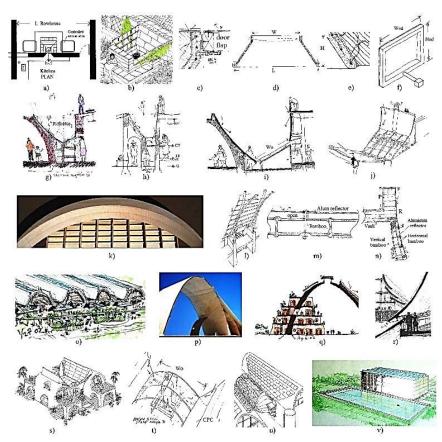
Supplemental Studies: a) row house plan showing reflections at E&W areas; b) trellises at E&W areas; c-d-e) ferrocement details at cookware door; f) cookware door; g-h) section drawings with vertical kitchen wall reflector; i-j) large CPC dryers; k-n) bamboo kitchen wall studies with aluminum reflector; o) multiple TRW nonimaging troughs for equatorial latitude locations with low seismic risk; p)sketch model of large vault for supporting fixed reflectors; q)large vault supporting fixed reflectors with multi-level housing; r) serrated fixed reflector trough side; s-t-u) reflectors on building vaults augmenting ETFE walk-in basin stills; v) building-integrated reflector façade augmenting adjacent salt gradient solar pond.
